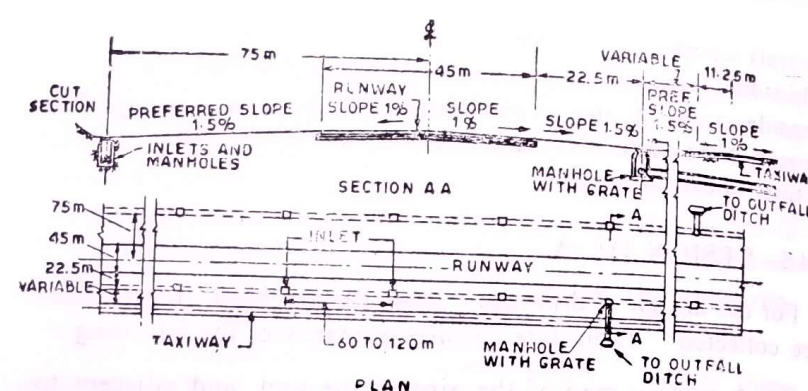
Recommended Drainage Layout for Runway and a Parallel Taxiway System (FAA)
